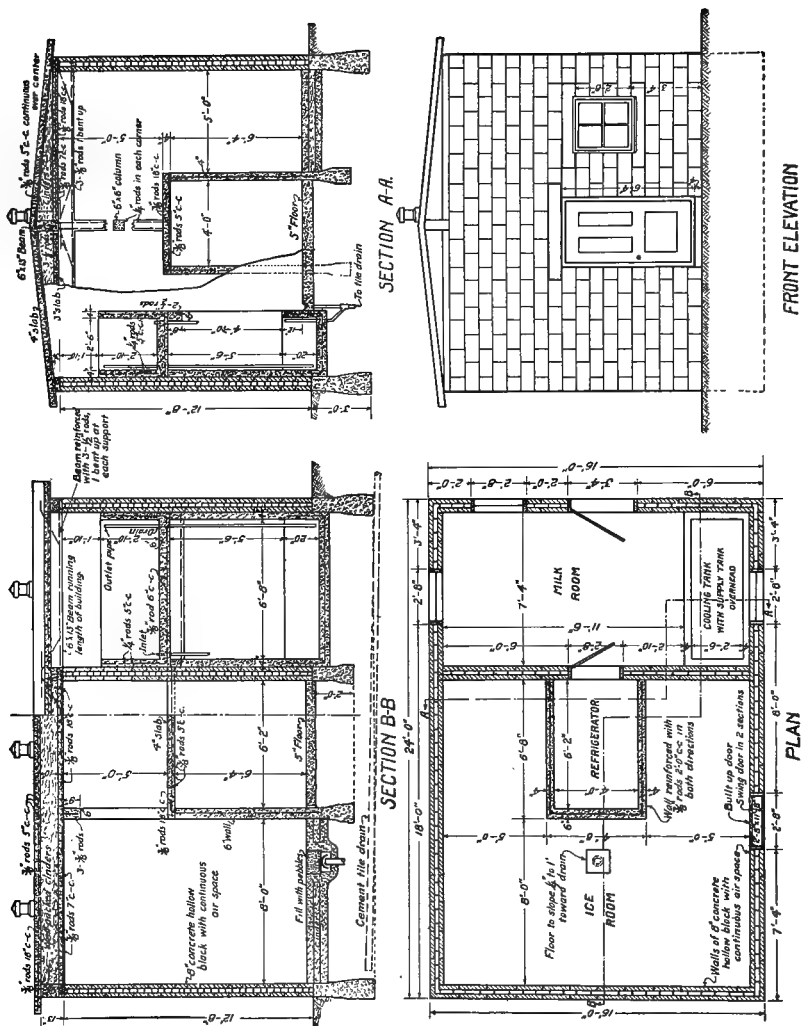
Concrete Block Dairy House with Ice Storage and Cold Room.
